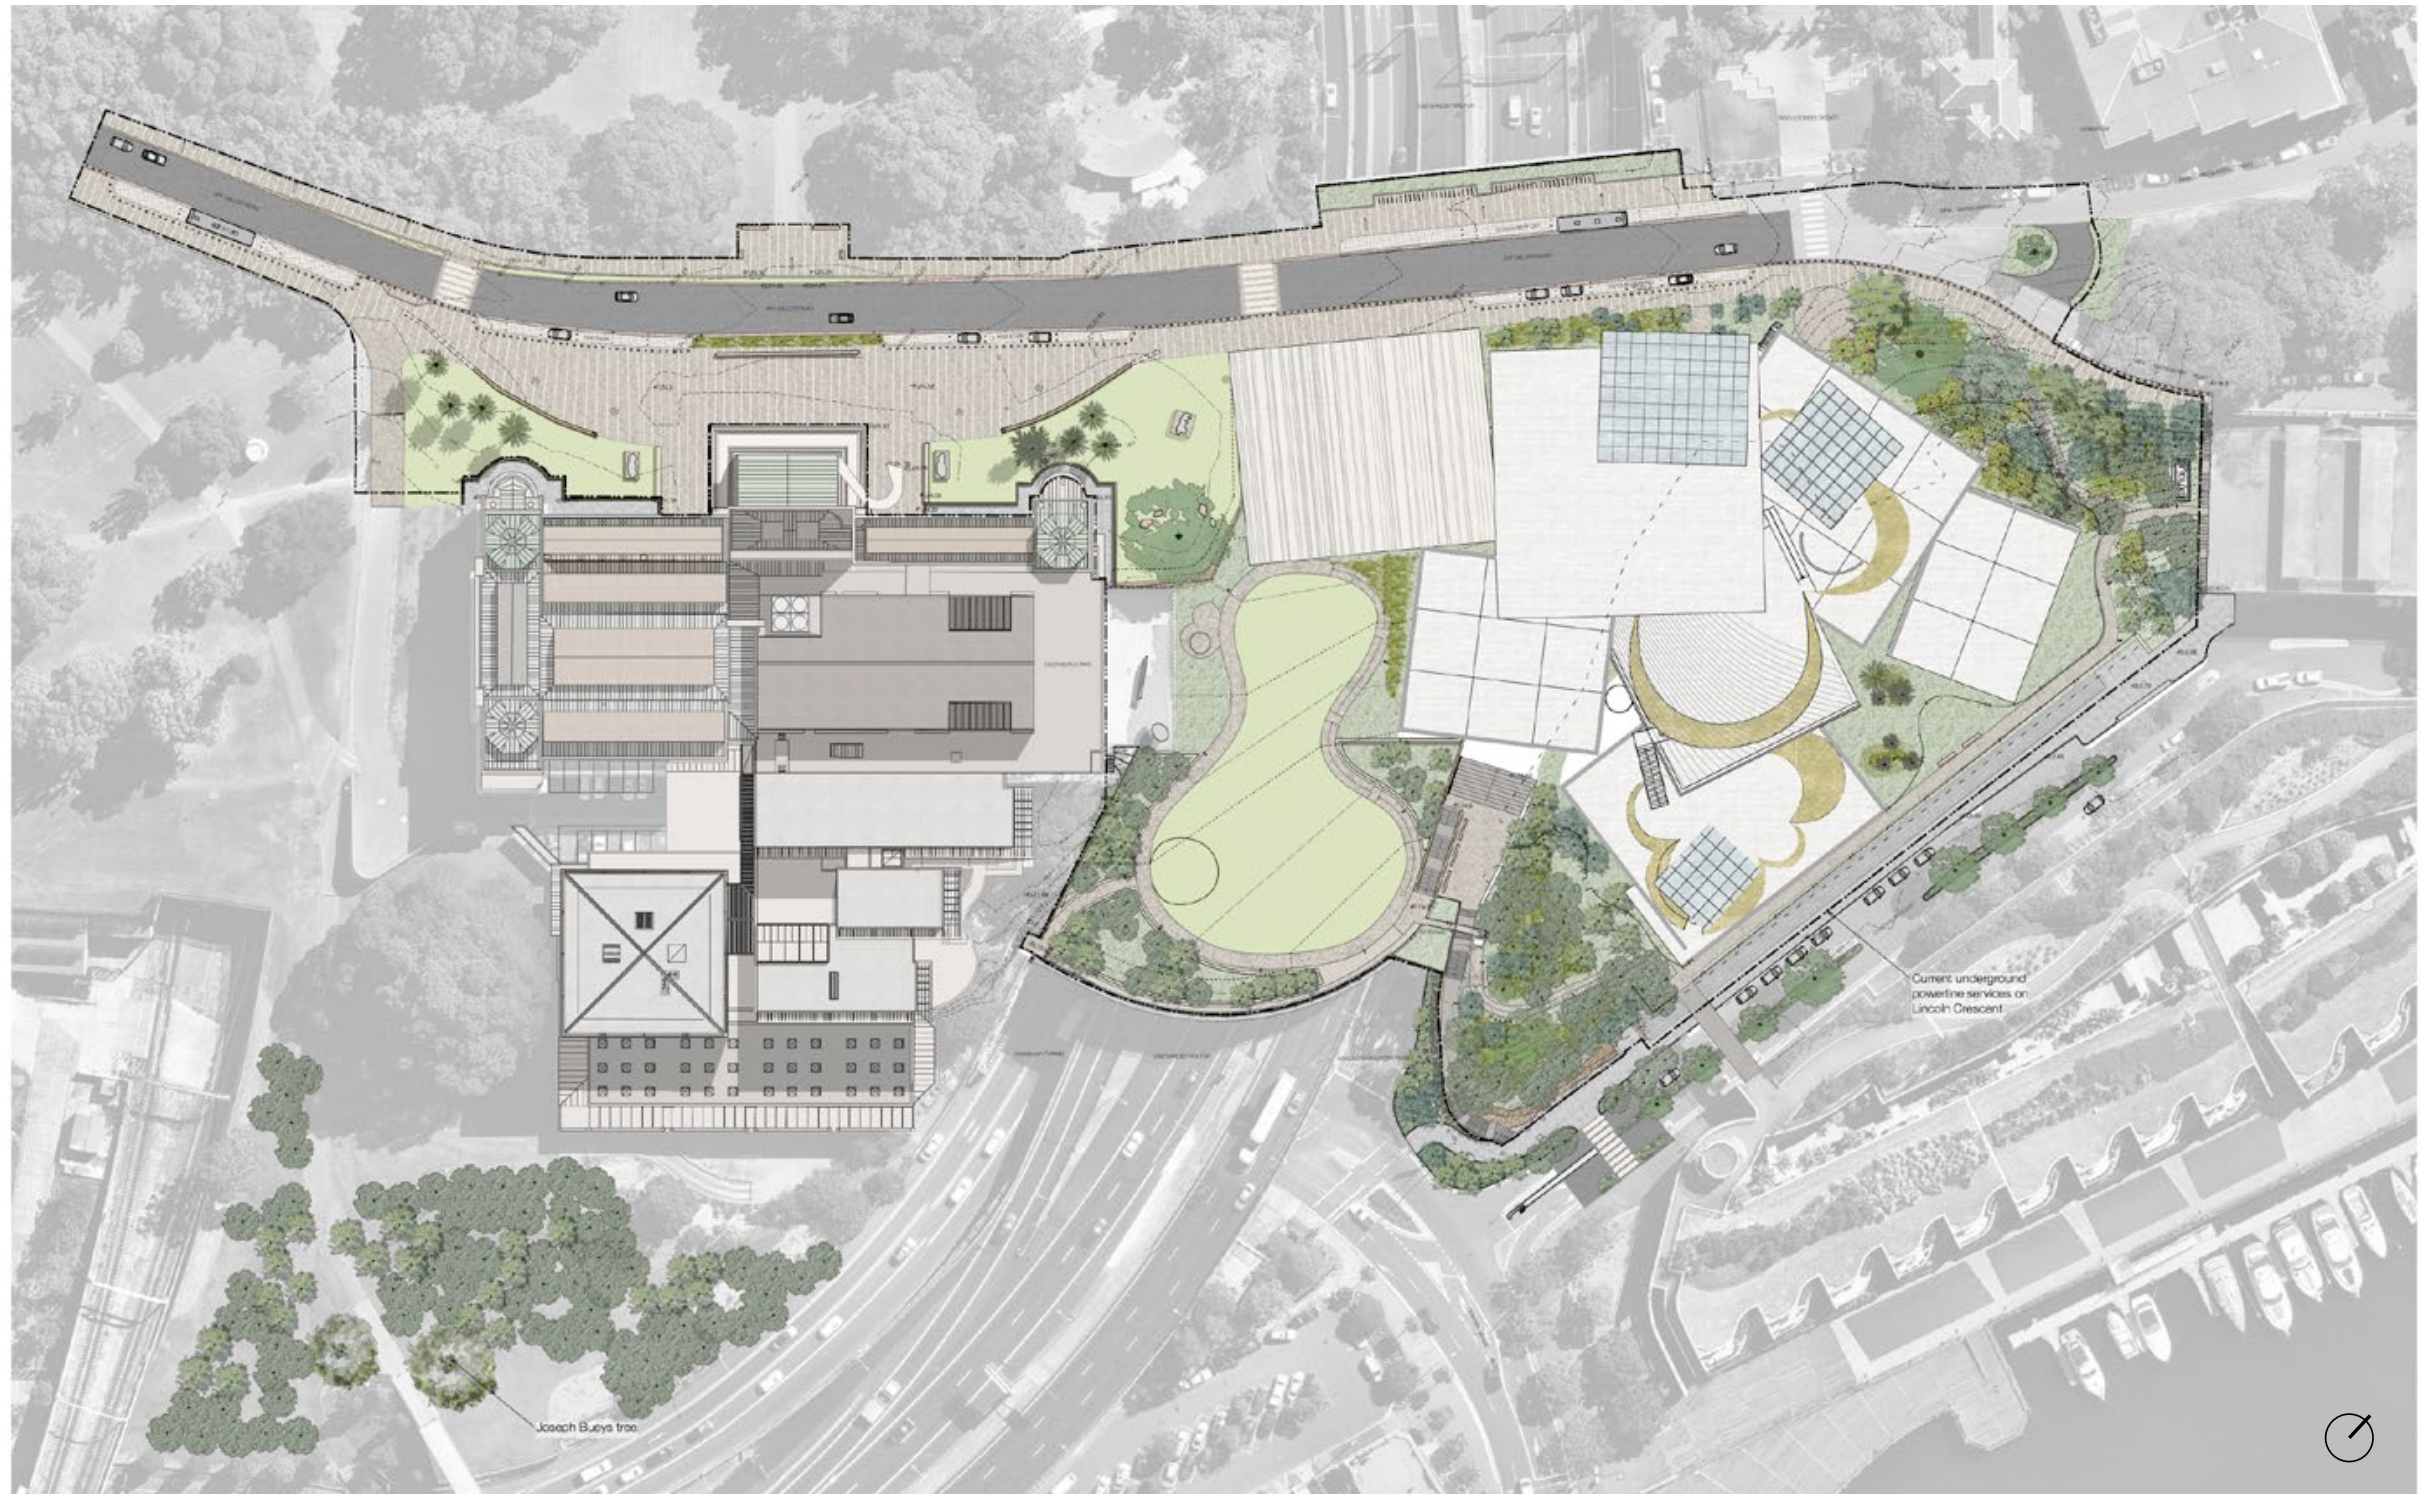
SMB Landscape Plan (McGregor Coxall Landscape Architects 2017)
